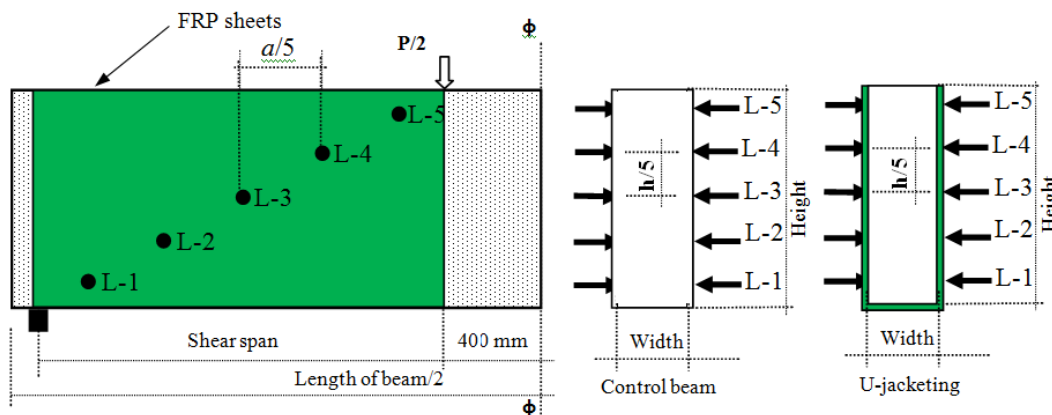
Typical LVDT arrangement for measuring beam out-of-plane displacement
